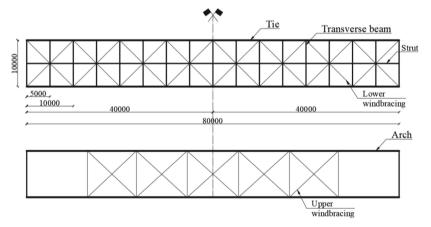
Geometrical arrangement for the lower and upper wind-bracings of the bridge.
